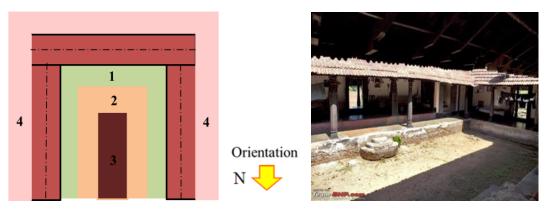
Maulibhadra (1 – Veranda, 2 - Portico, 3 – Pillared court, 4 – Gallery) (Source: www.team-bhp.com)
